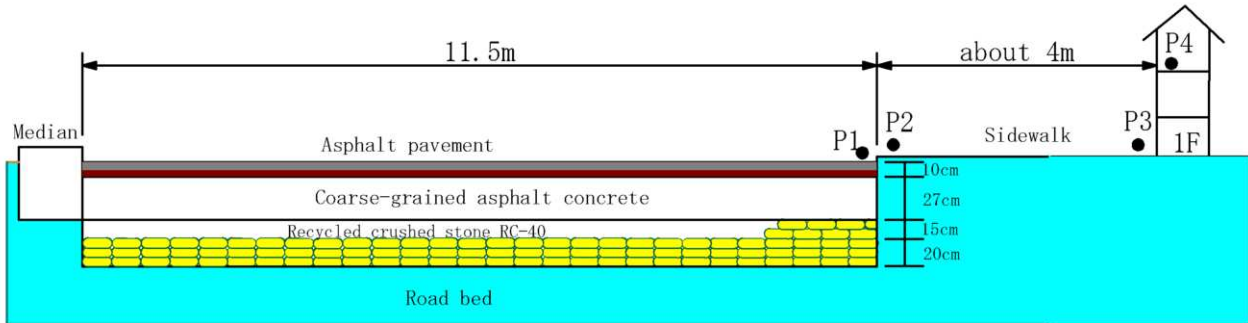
Schematic view of reinforcing the truck road under asphalt pavement with soilbags and the locations of the vibration measurement points.
